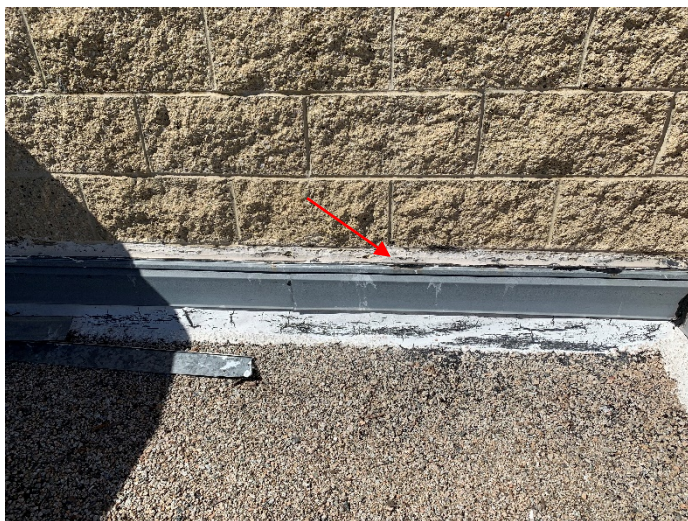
Drama classroom roof, view of lower north wall east of AHU duct, showing asbestos-containing off-white flashing caulk
